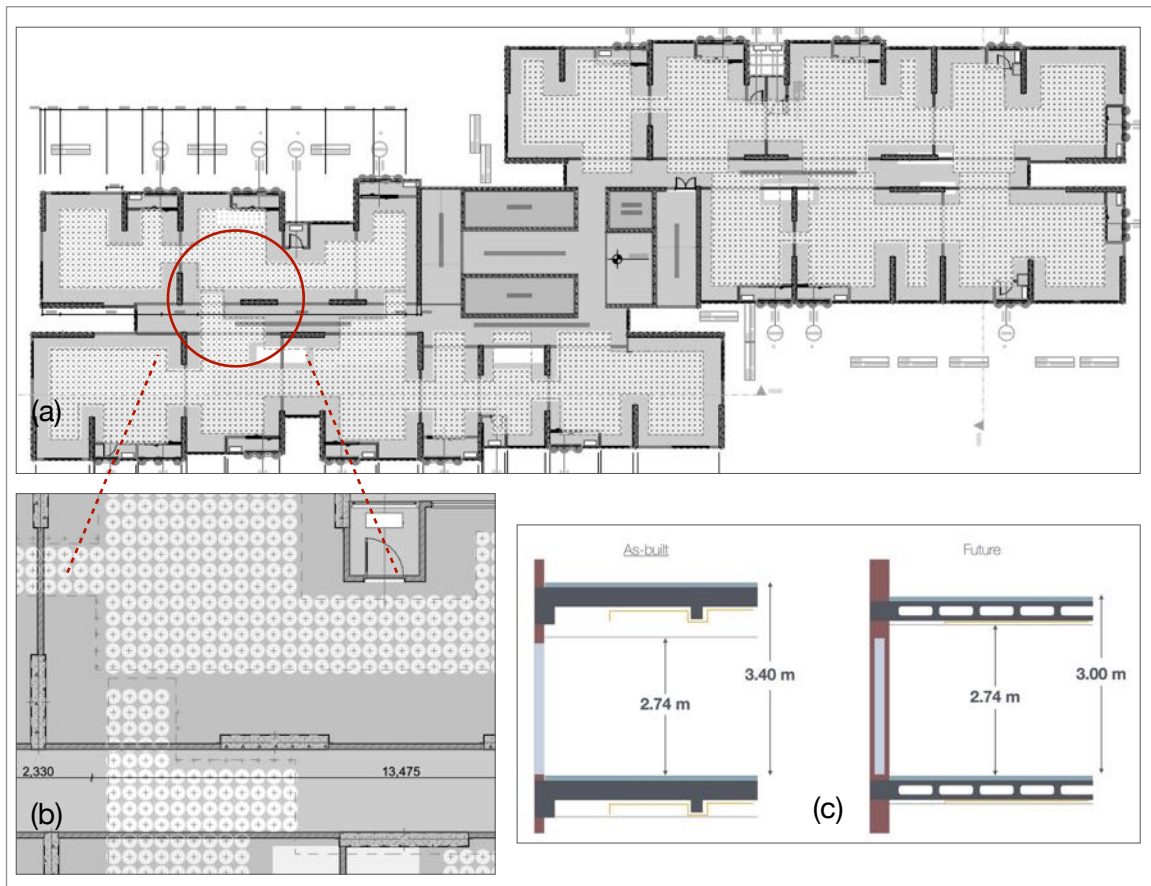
(a) Tonkin 2 Floor Plan with Concrete Spacers, (b) Zoom Concrete Spacer, (c) Slab Section before and after using Concrete Spacers
